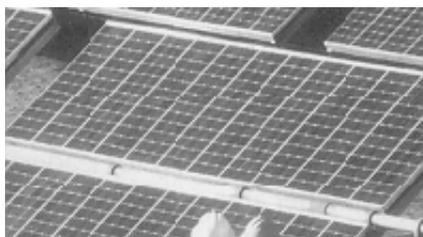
SMUD/WAPA Building Integrated 3 kW PV Roofing System
